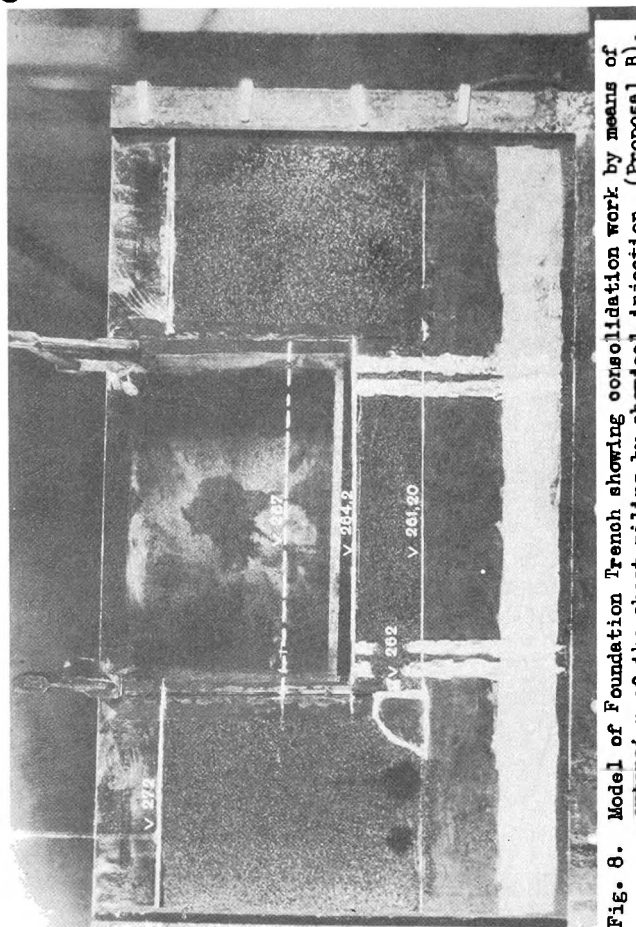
Model of Foundation Trench showing consolidation work by means of extension of the sheet piling by chemical injection (Proposal B).
